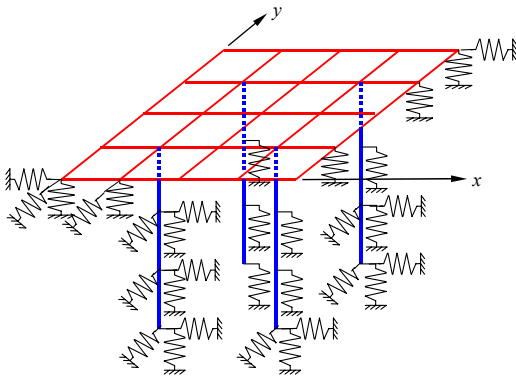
Plate-beam-spring modelling of a piled raft foundation.
